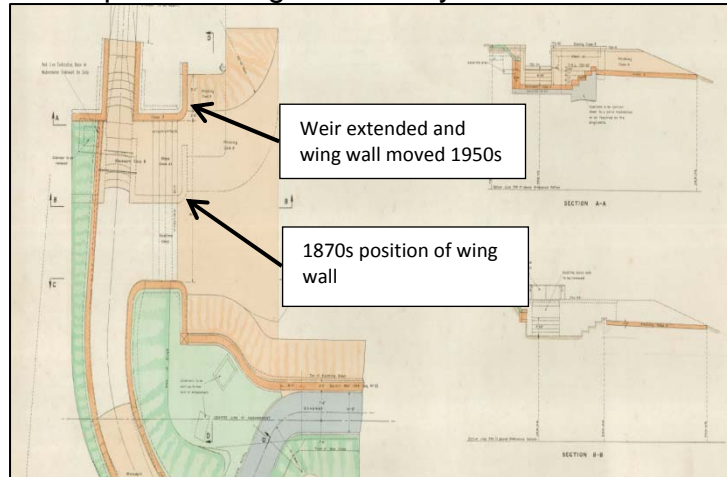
1950s weir widening detail (extract from UU drawing ref BOL_t073-(F))
